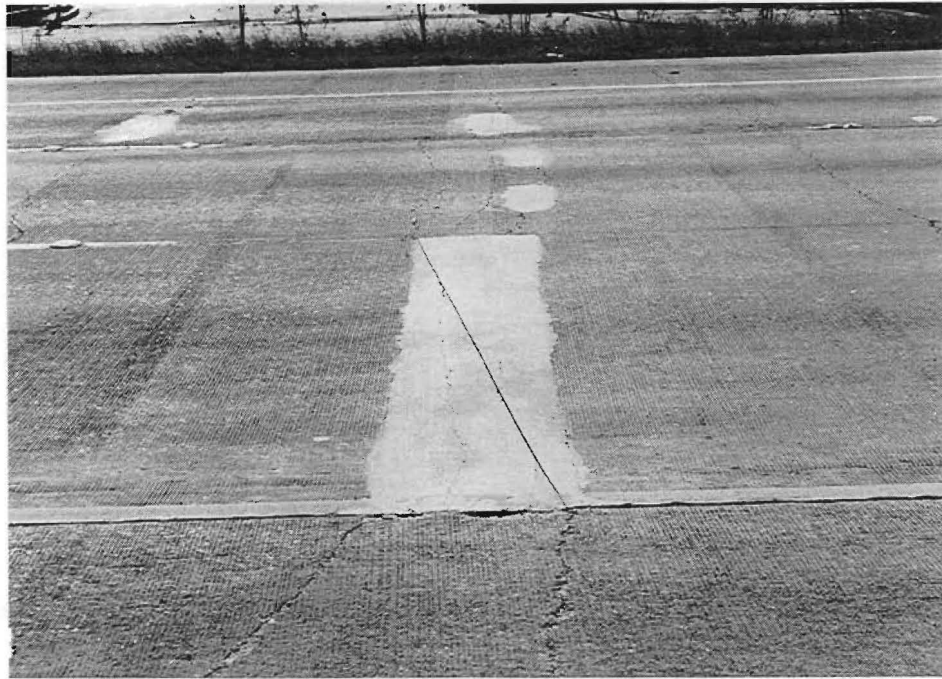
Transverse Cracking and Minor Spalling in a Block Repair (January 20, 1995).
